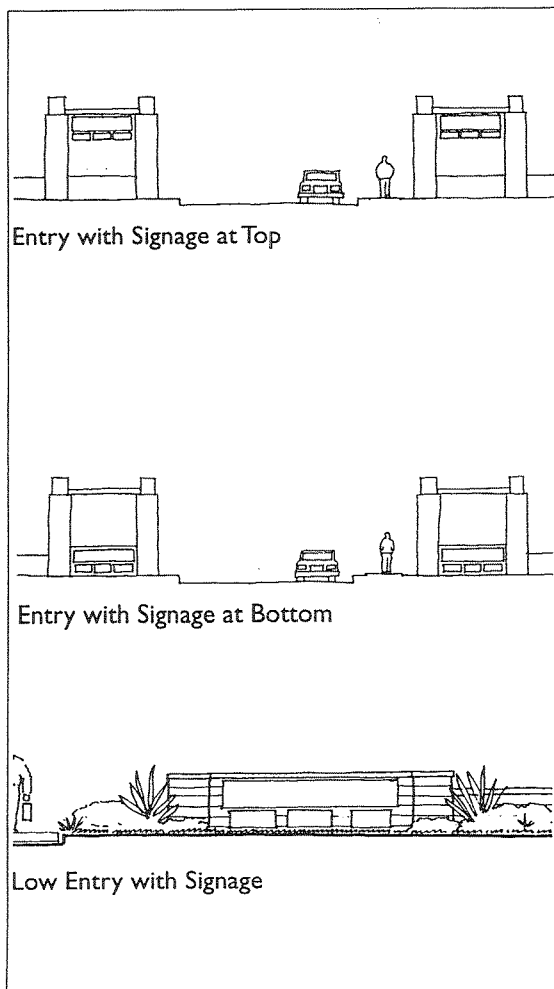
, Village Wall Signs, Position at Project Entries. Village Wall Signs announce major entries to commercial projects. These “pylons” should be placed symmetrically about the most commonly used entry drives. For projects under 8 acres, one major entry may be flanked by Village Wall Signs; for projects over 8 acres; two major entries may be flanked by Village Wall Signs.
